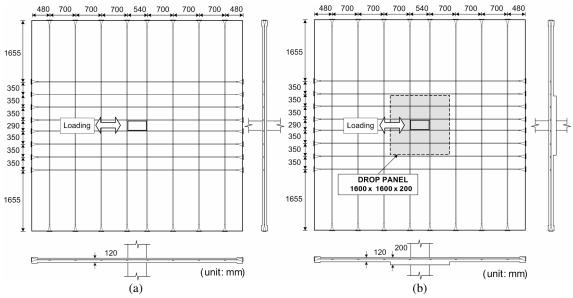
Layout of prestressing strands: (a) specimen without drop panel, (b) specimen with drop panel
